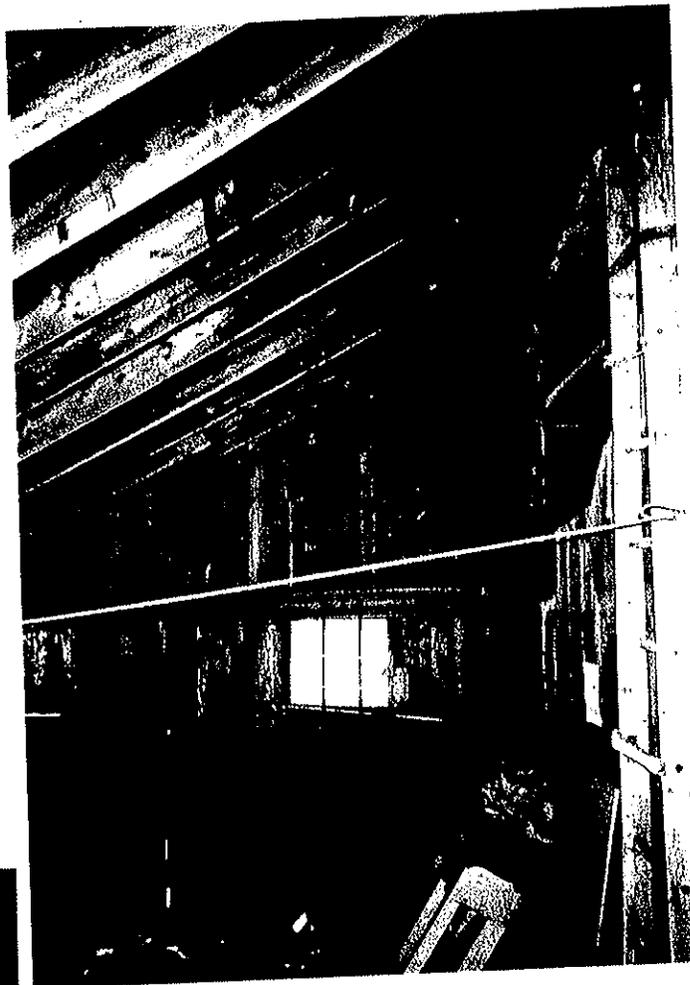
Weir Barn - Lean-to Shed [Room 104], West Wall, Doorway D116 (1995).
